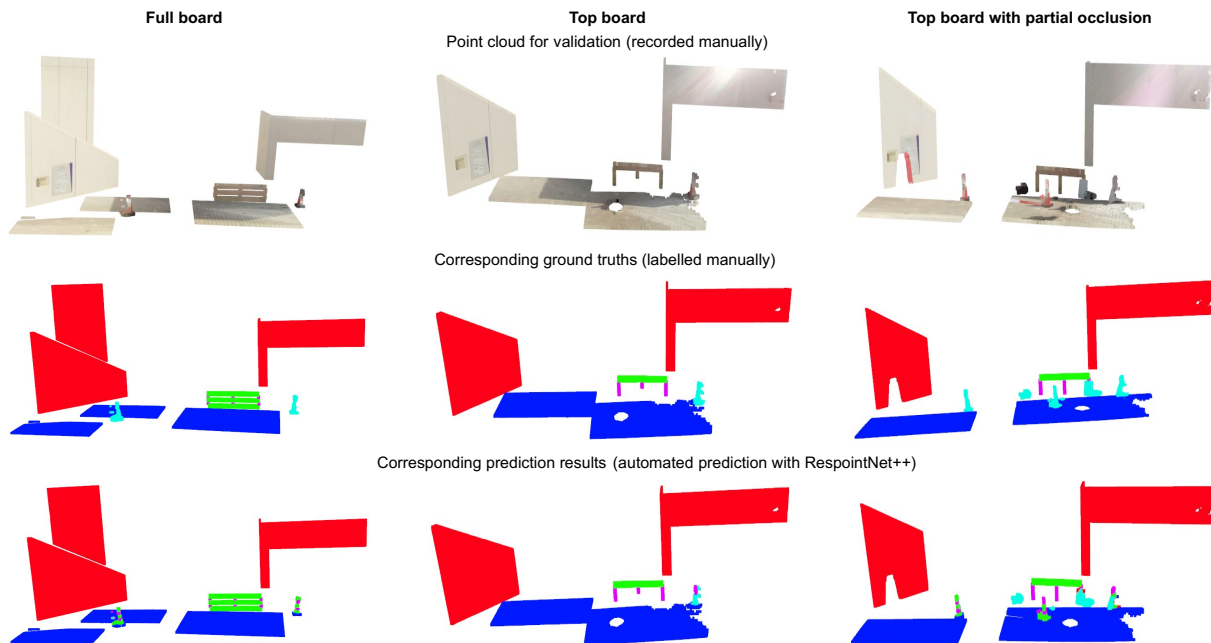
The predictions are shown for different classes of the guardrails' full board, top board, and top board with debris. Color values correspond to: Red – wall, Blue – floor, Green – guardrail board, Pink – guardrail pole, and Cyan – debris.
